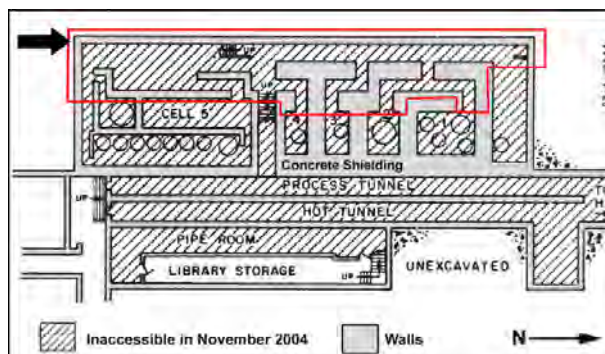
Building G2, Basement, 325-Foot Level, Cell Access Corridor
